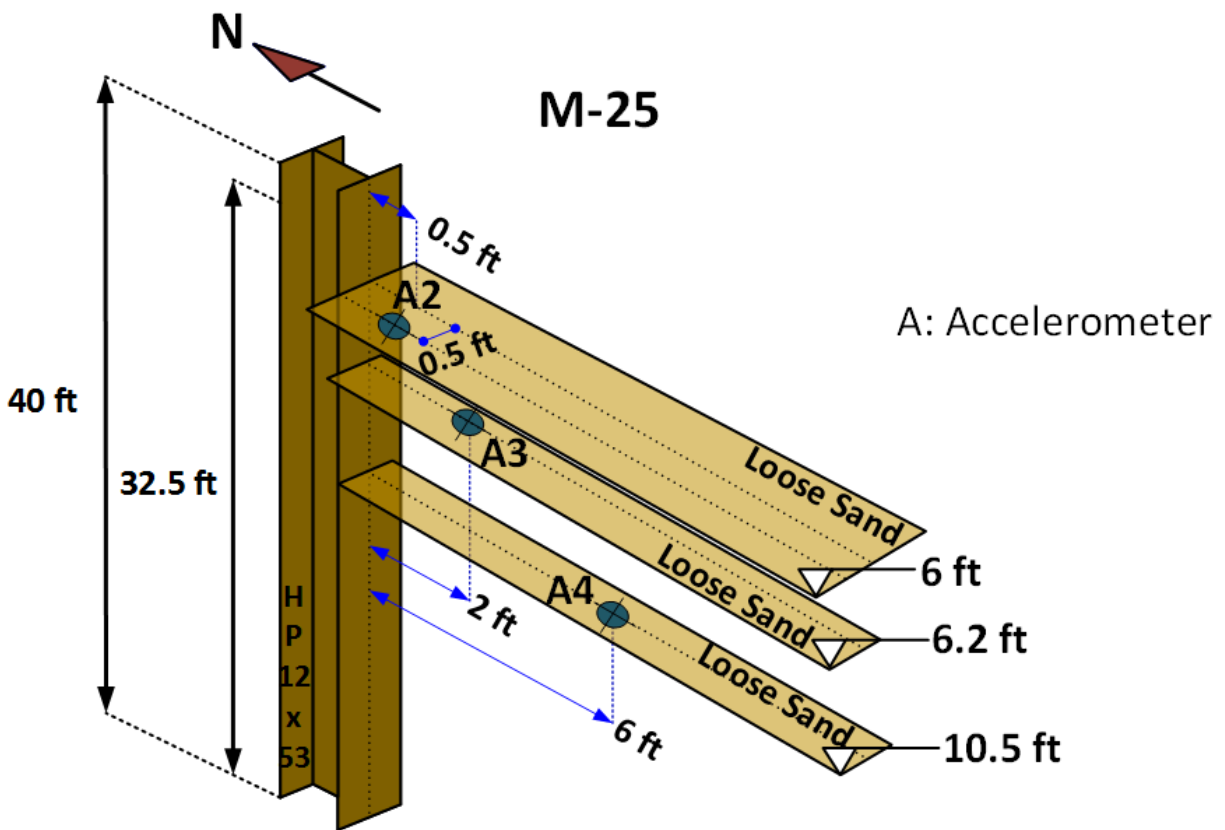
Perspective view of buried sensors at M-25 site (not to scale)
